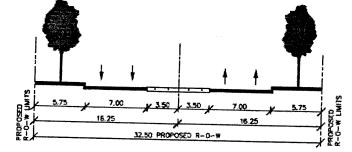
Typical cross-section South of Front Street to Rail Corridor.
